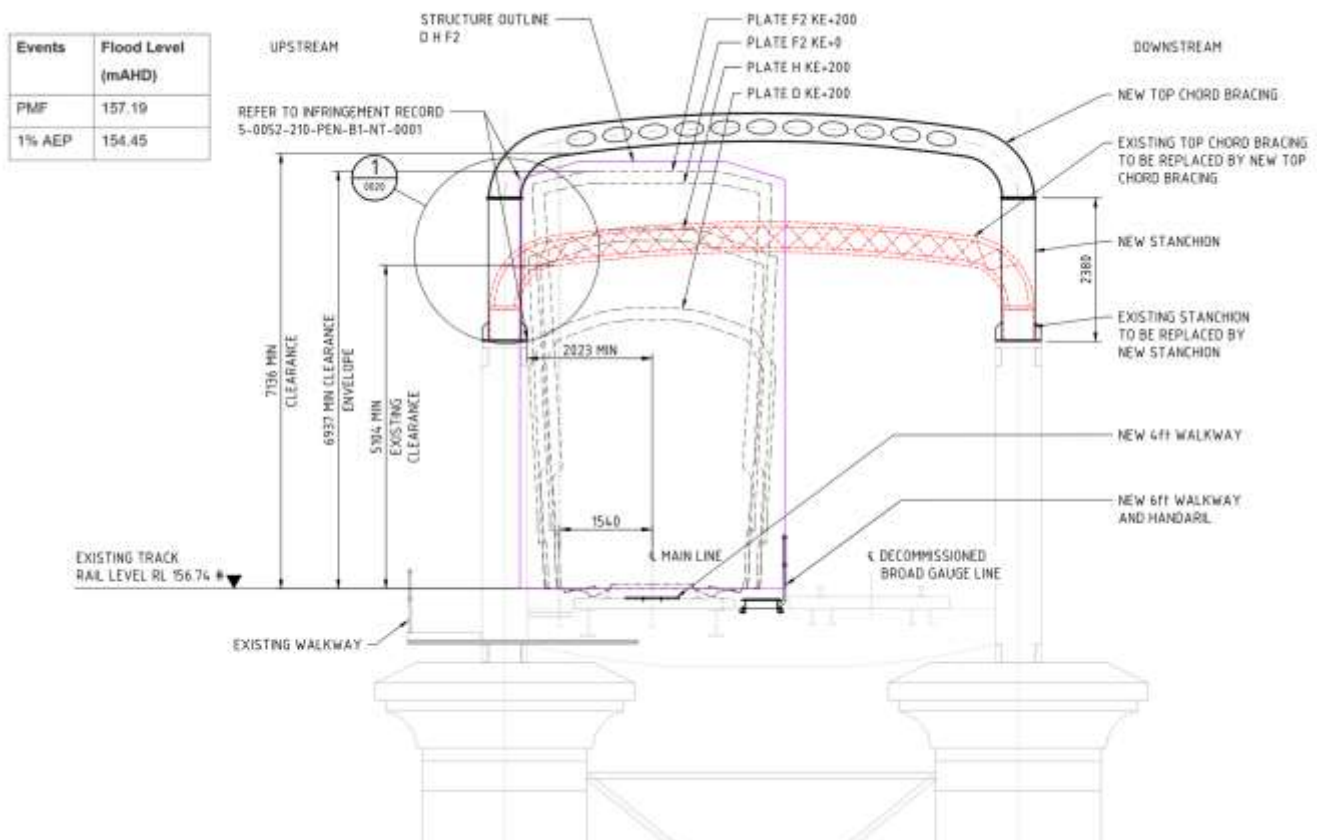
Murray River Site – Design Cross-section (Item 2 in Table 1-2)
